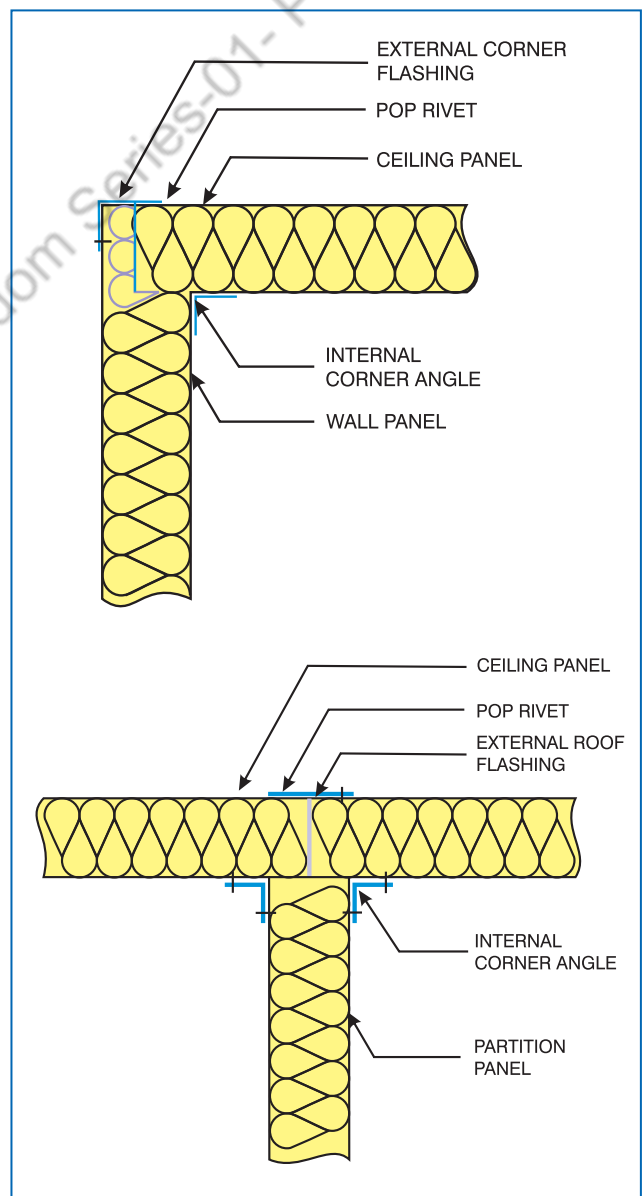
Wall-to-wall corner and partition-to-ceiling details
